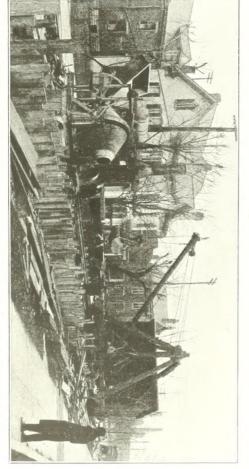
BUILDING THE BUCKEYE STREET SEWER, HAMILTON
